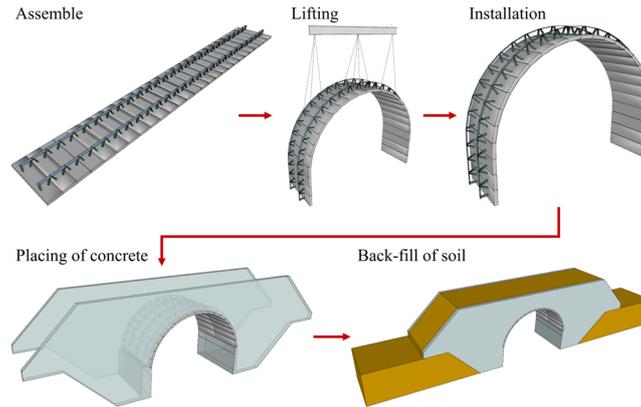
Fabrication and construction steps of the modular underground arch culvert specimen
